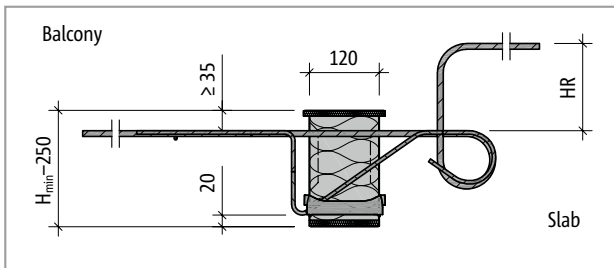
Schöck Isokorb® XT type K-HV: Product section
